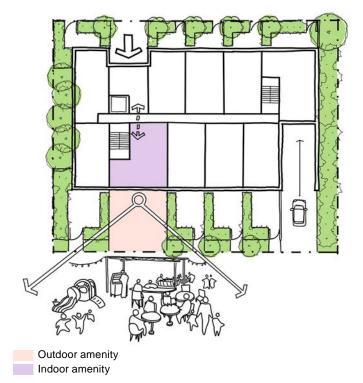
Indoor and outdoor amenity co-located along daily travel routes, connected to the building lobby and separated from the vehicle entry.
